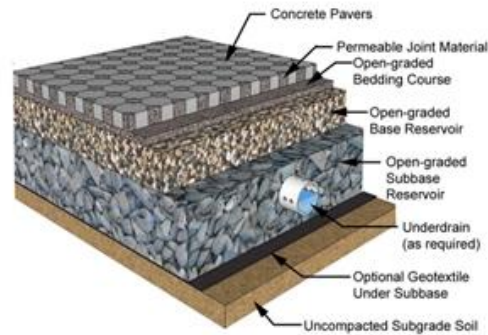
Typical Section of Concrete Pavers and Drainage System – [ICPI, 2014]
